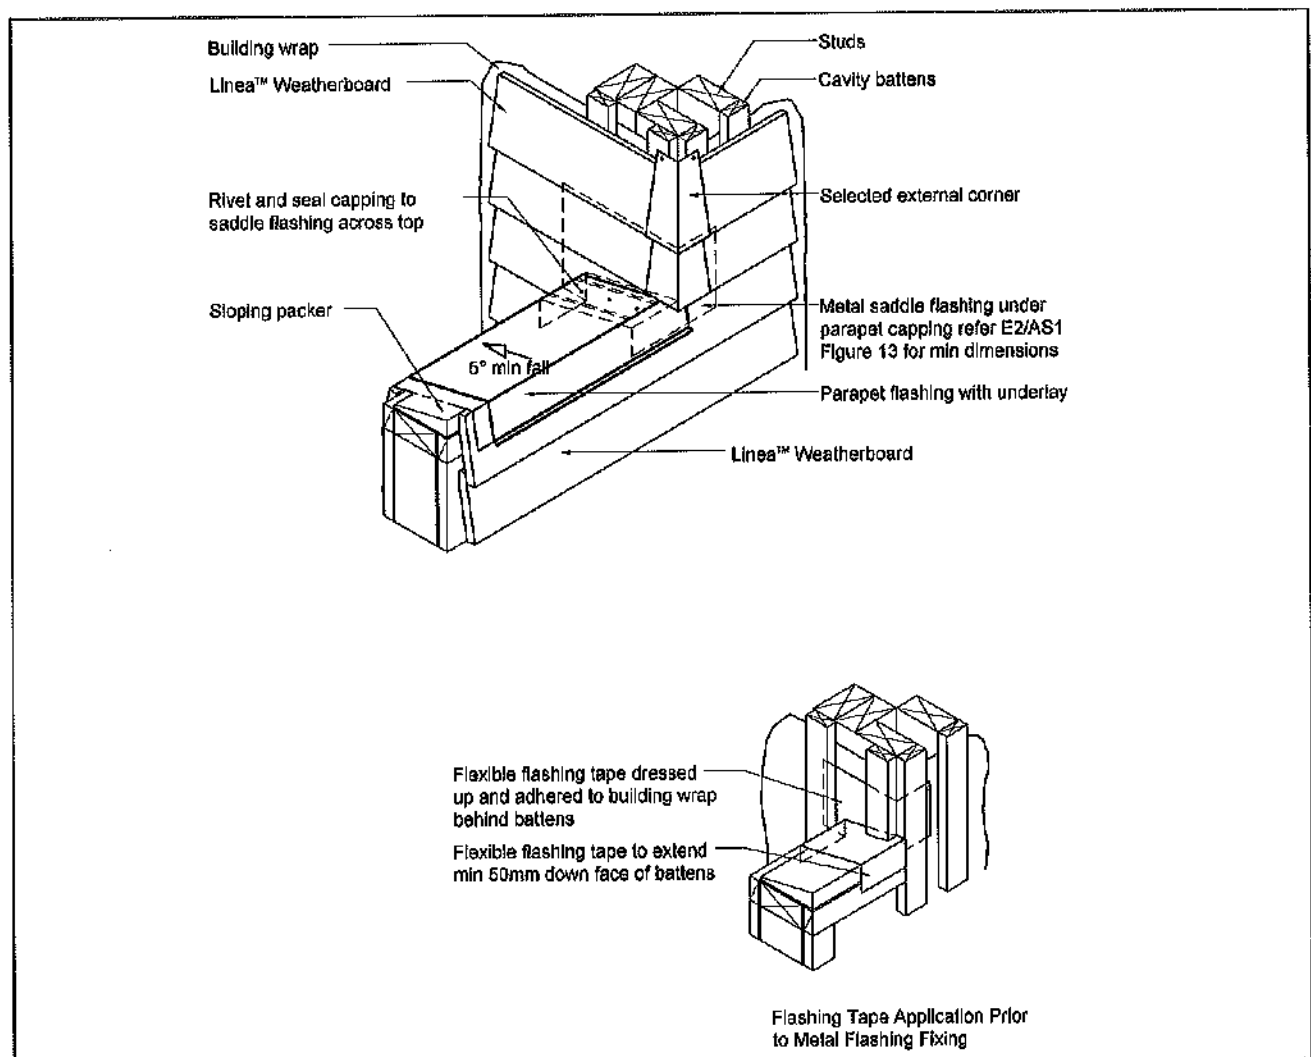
CAVITY ENCLOSED BALUSTRADE TO WALL
